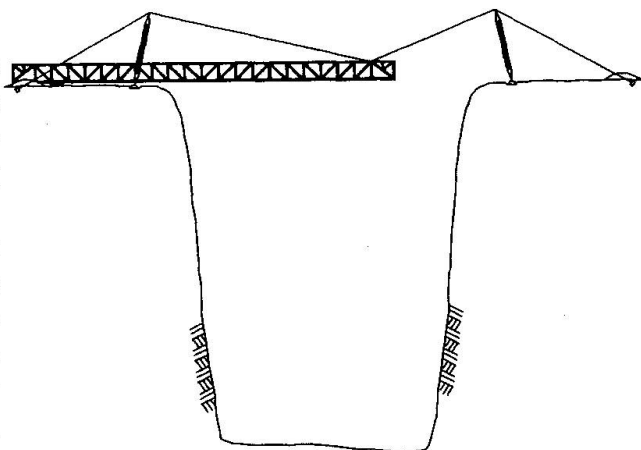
Pashleth Creek Bridge, erection scheme adopted by the contractor
